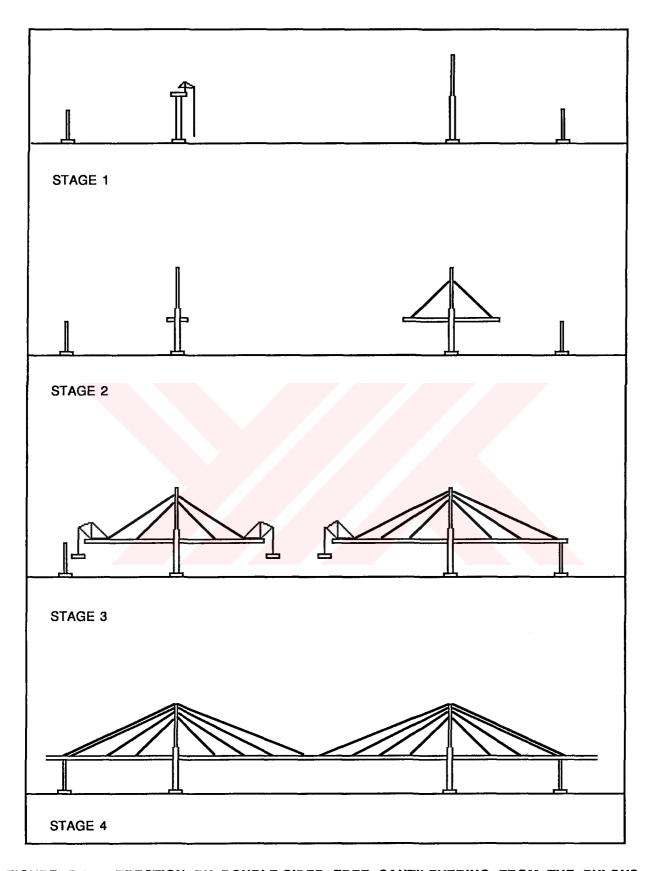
ERECTION BY DOUBLE-SIDED FREE CANTILEVERING FROM THE PYLONS
